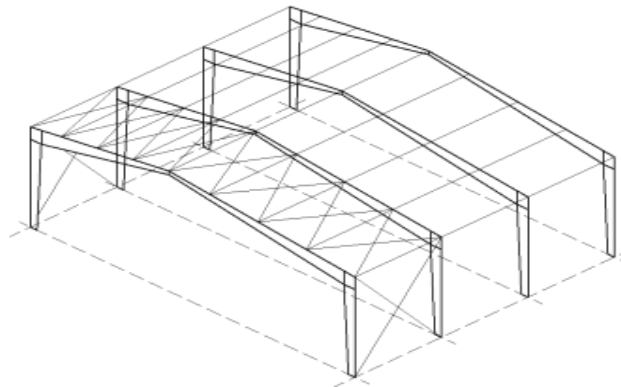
Horizontal bracing (in the roof) in a single storey building
